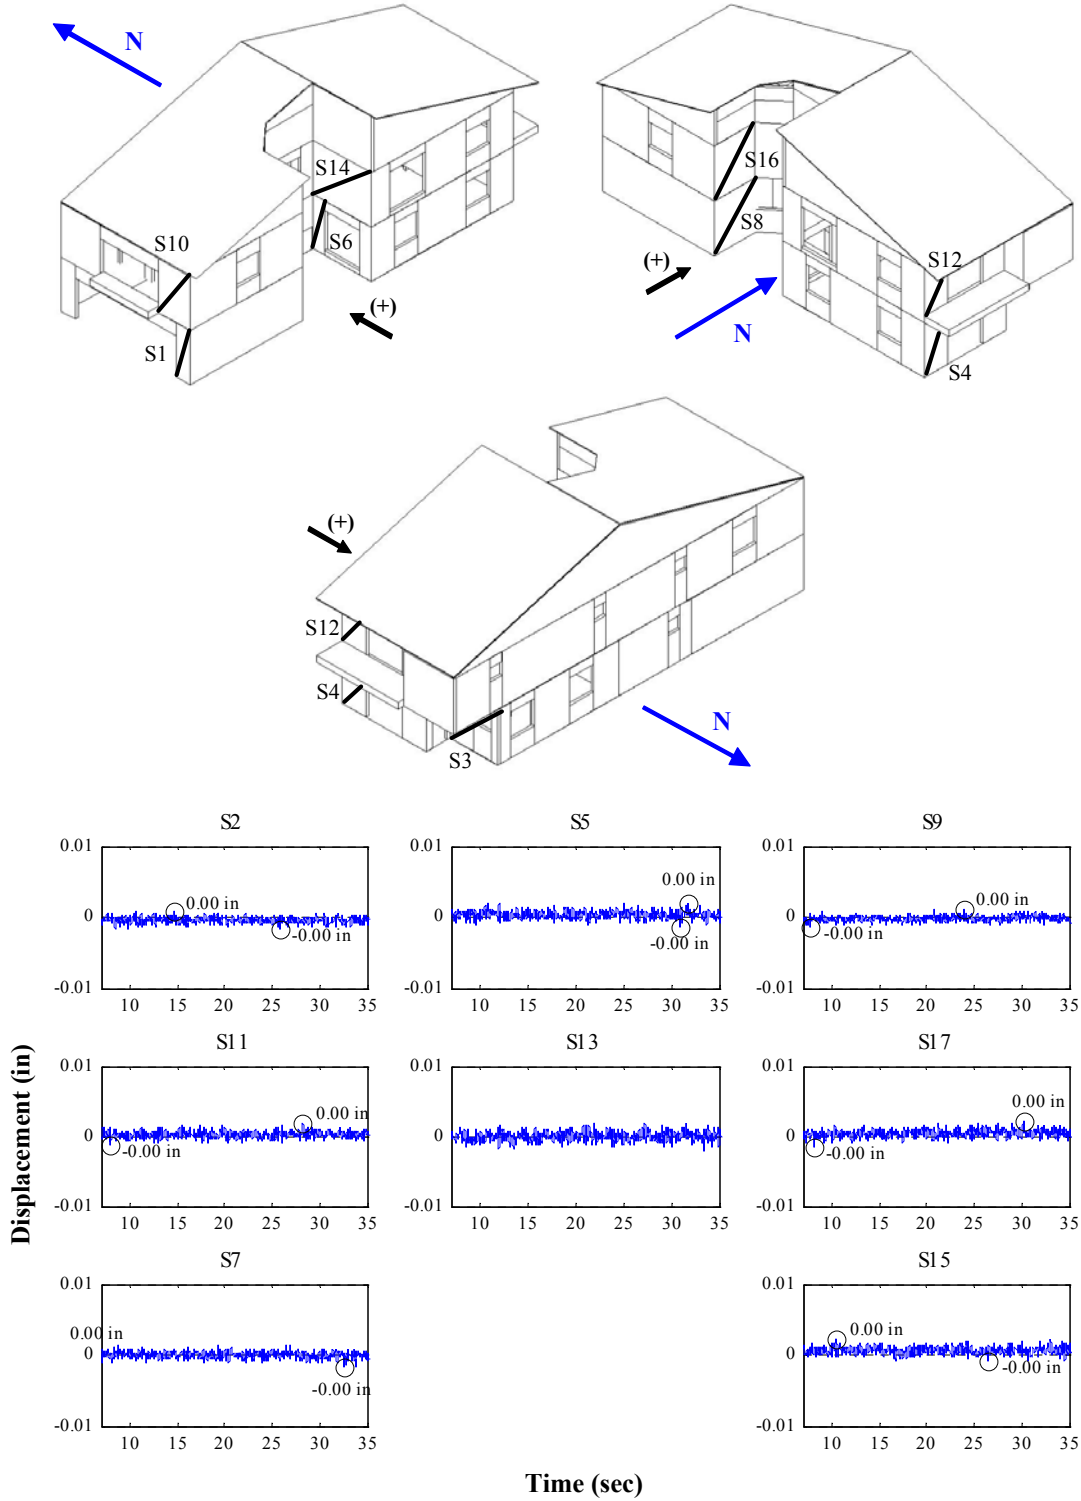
Wall deformations of north-south external walls for Test NWP2S07
